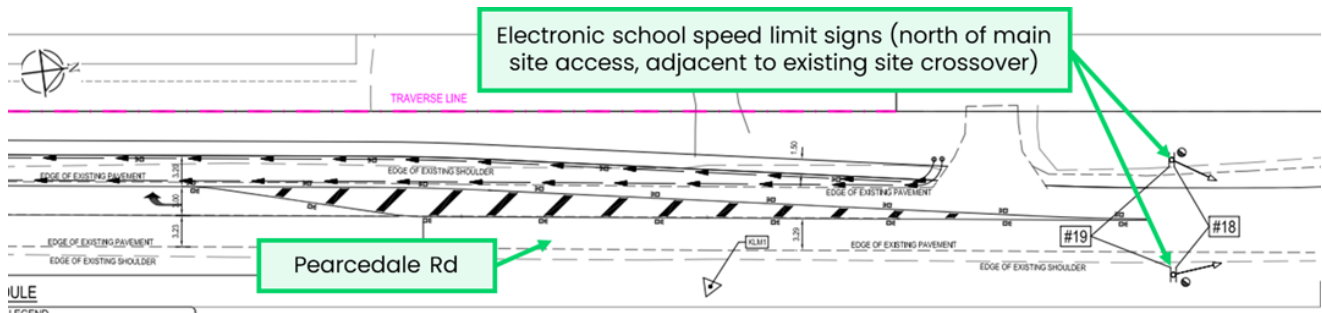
Approved Engineering Construction Plan at the new main site access along Pearcedale Road
